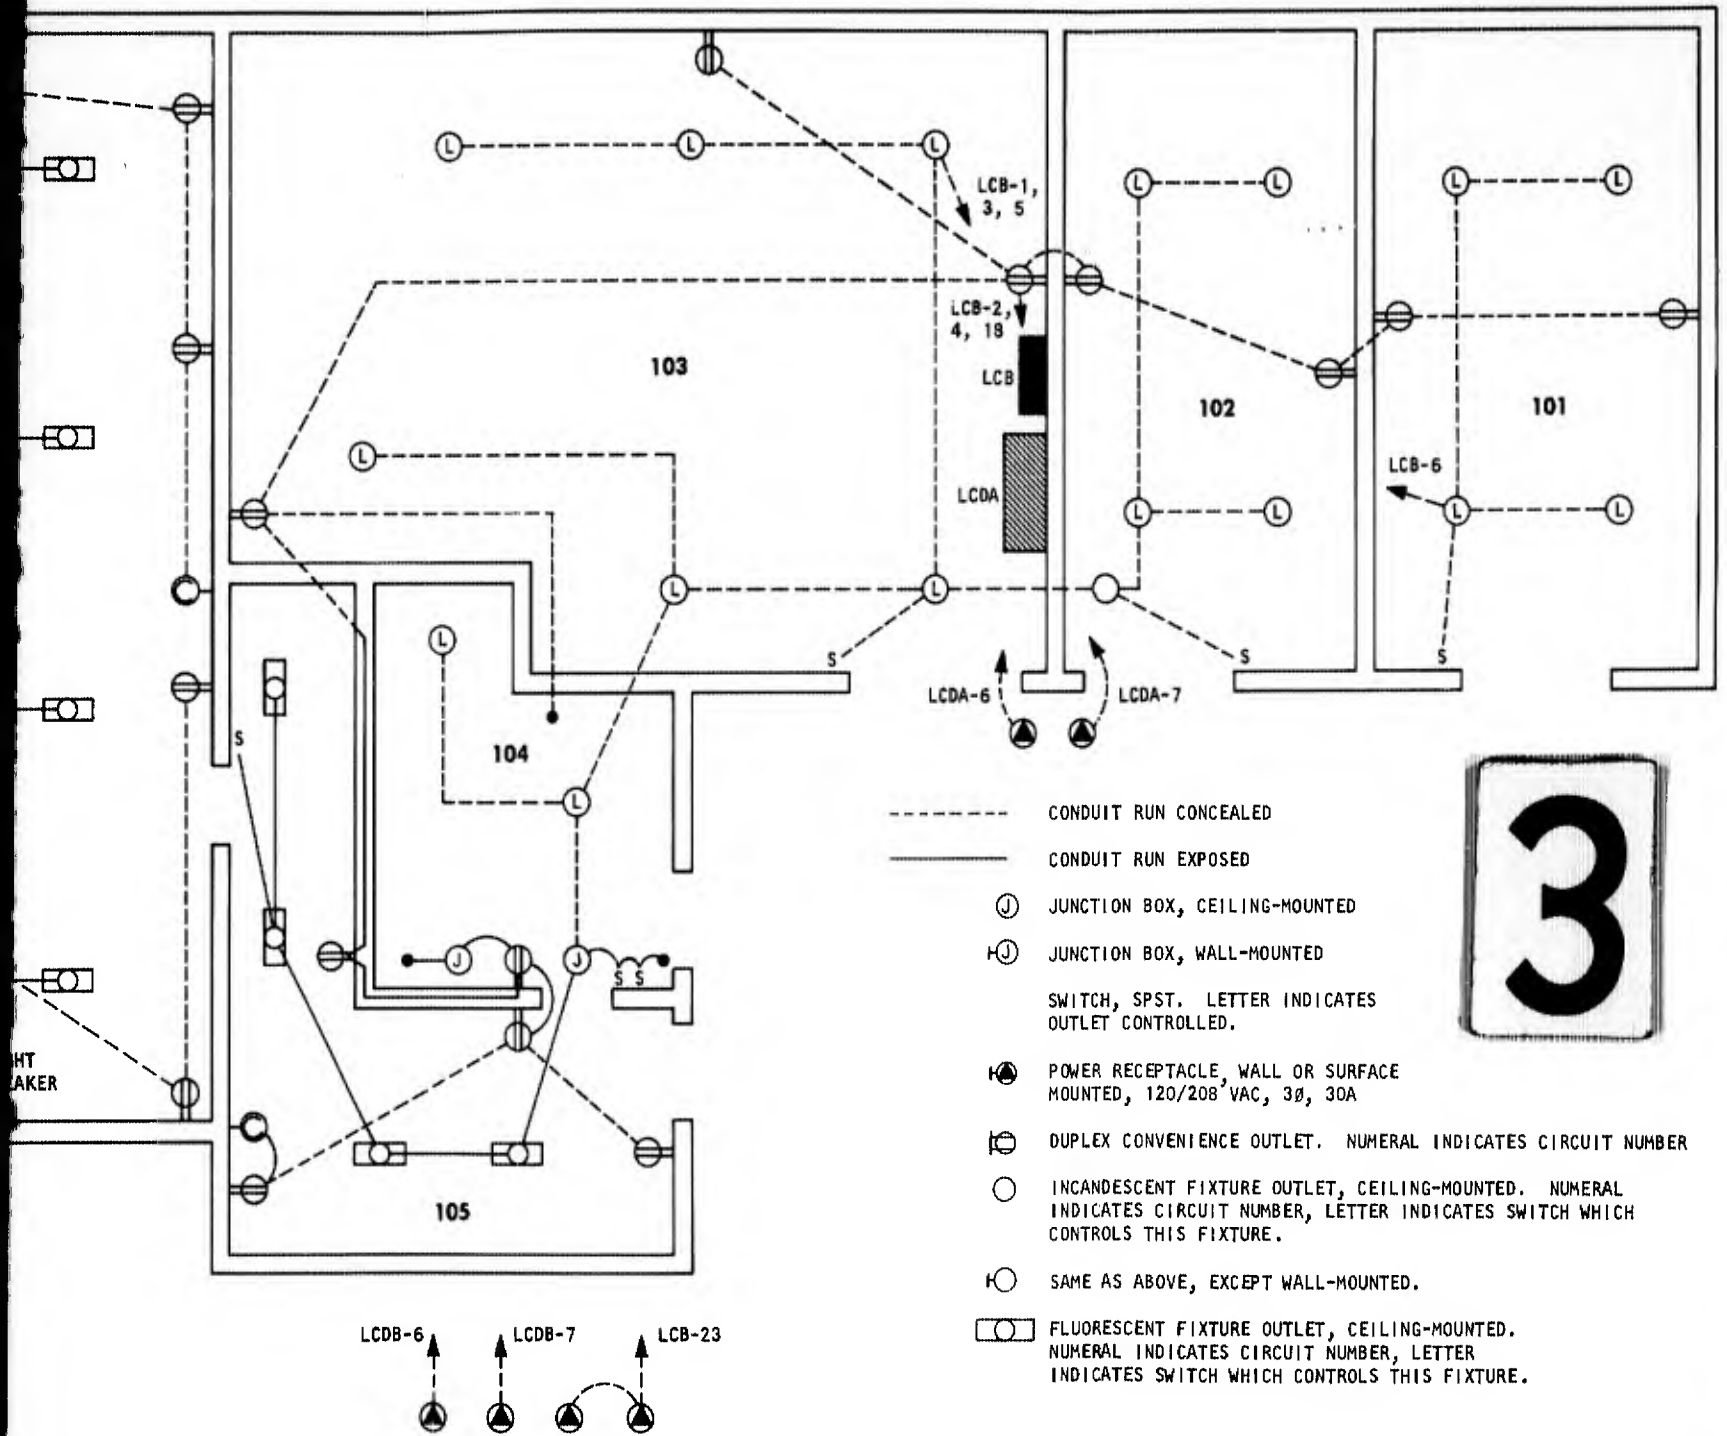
LCF Support Building Lighting and Receptacle Plan
